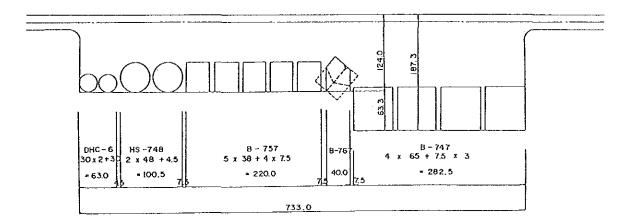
Dimension of Passenger Terminal Apron
